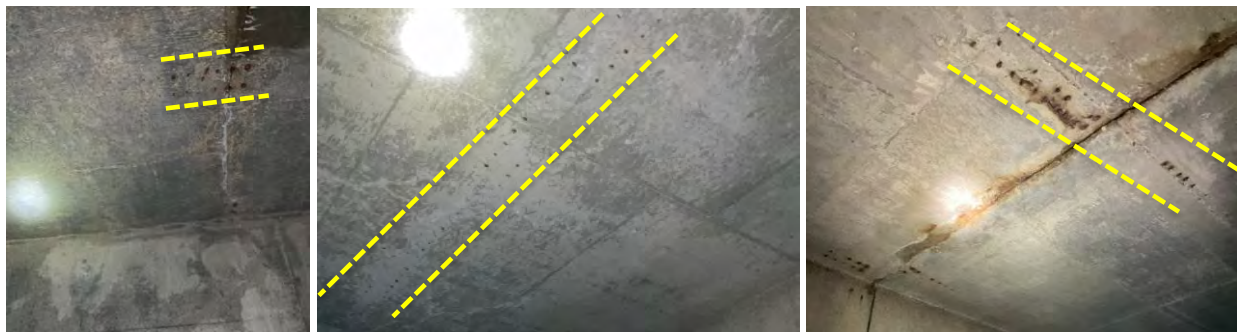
Typical Reinforcement Spacers Recommended for Repair
